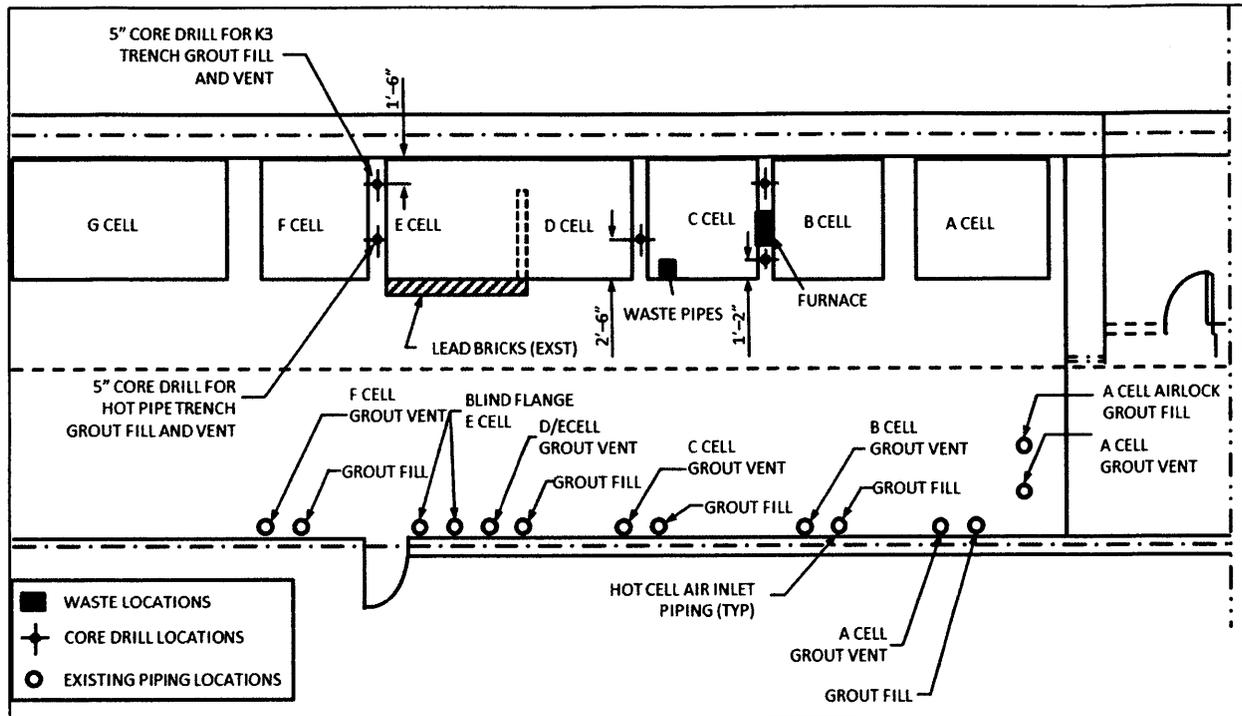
Core Drills and Grout Addition Locations in Canyon
